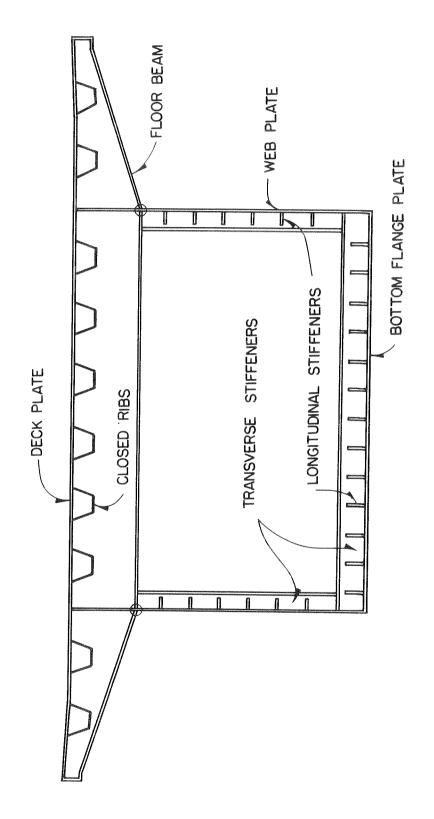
TYPICAL CROSS-SECTION OF ORTHOTROPIC STEEL DECK BRIDGE
